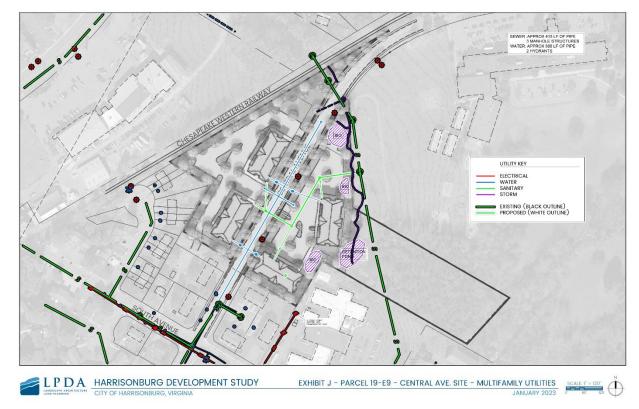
Exhibit J: Central Avenue multi-family SWM/Utility concept plan
